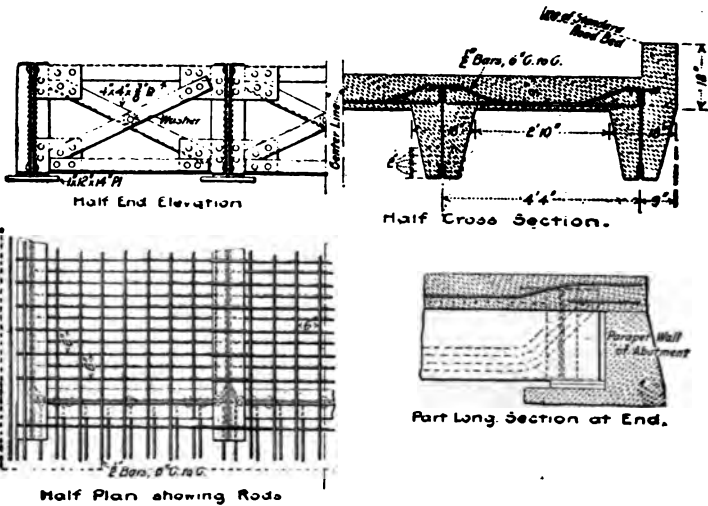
Trough Floor Supported by Old Girders Strengthened with Reinforced Concrete.
